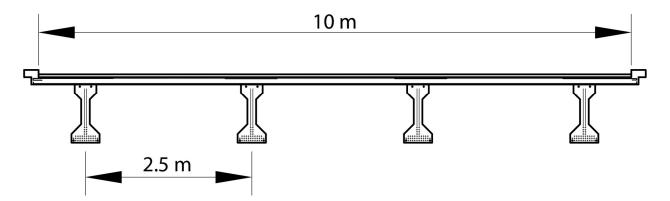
Sample cross-section of the bridge to be designed
